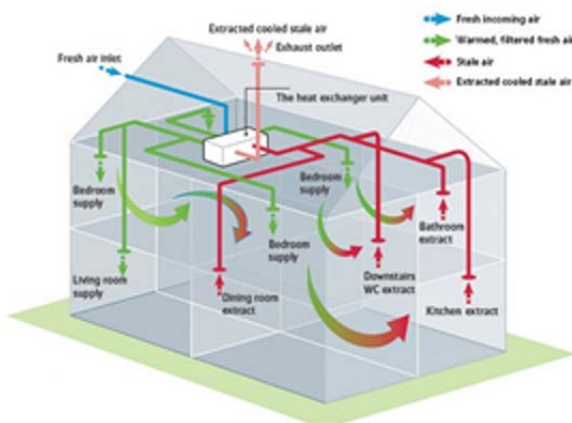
Typical Mechanical Ventilation Heat Recovery (MVHR) Arrangement
